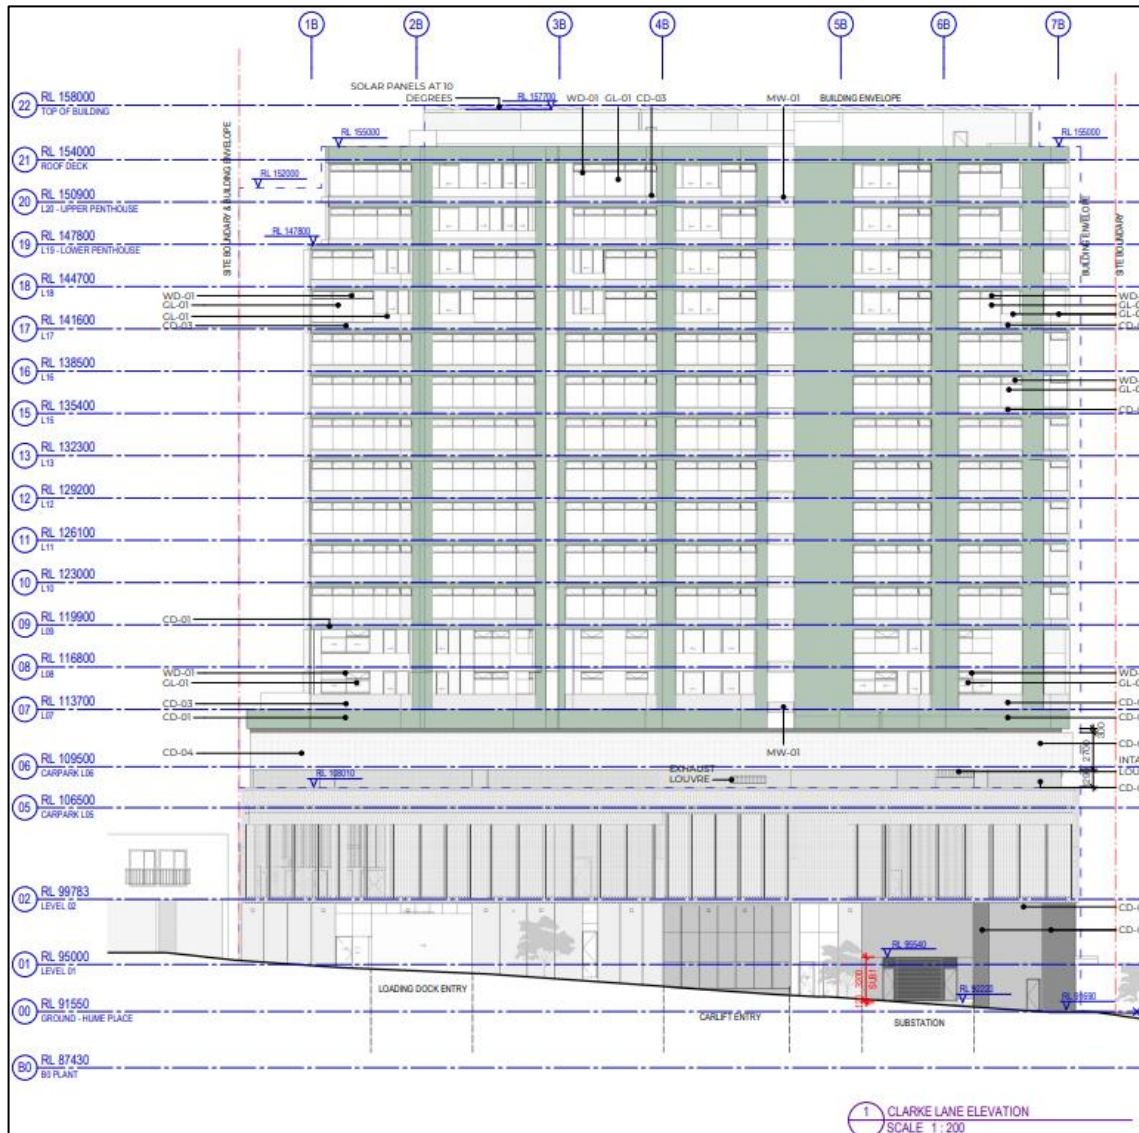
Clarke Lane Elevation (Source: Woods Bagot, 2023)
